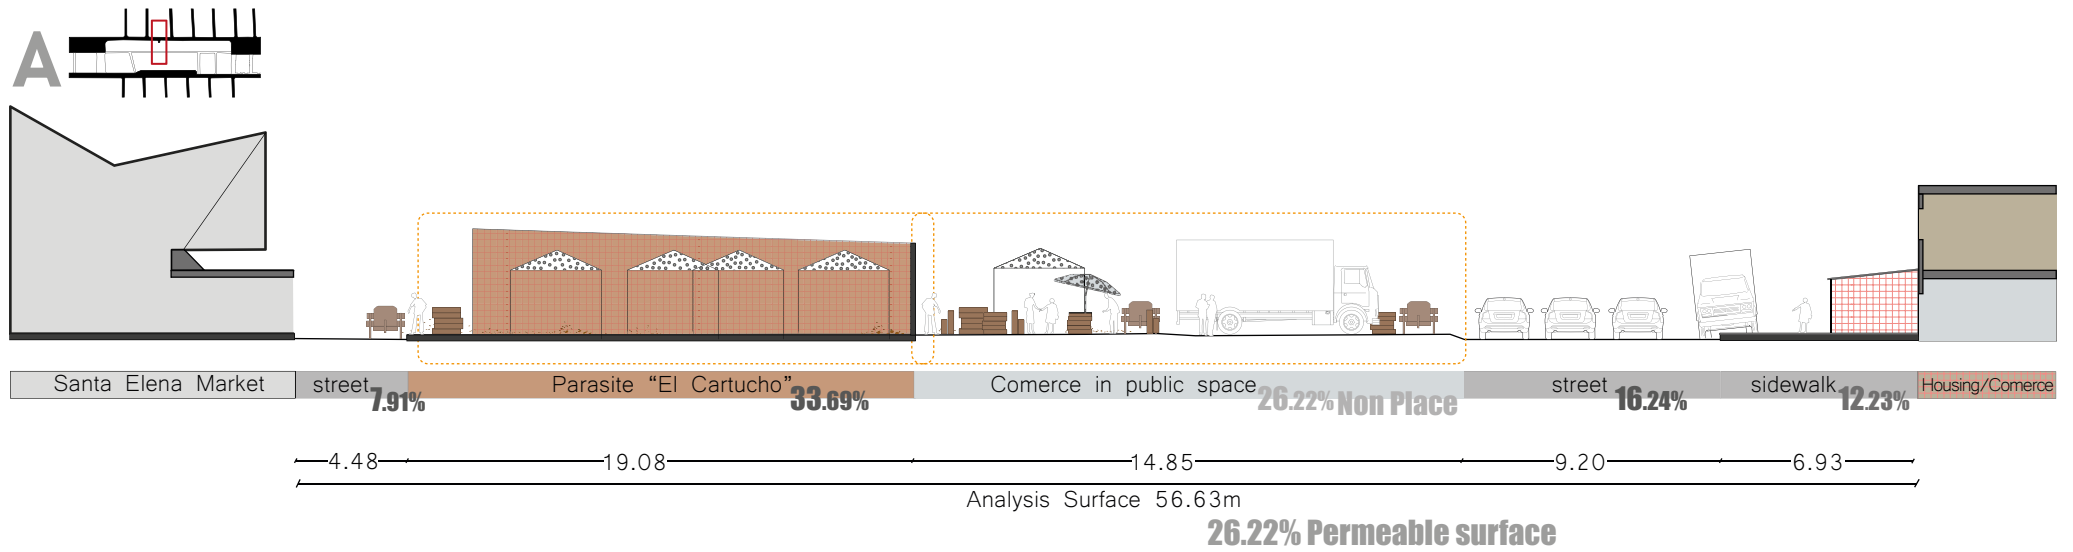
Section Calle 25. Santa Elena Market Urban context Elaborated by the author.
